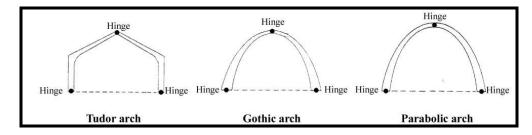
Three hinged arches have three general forms (Hornbostel and Hornung, 1982:183).
